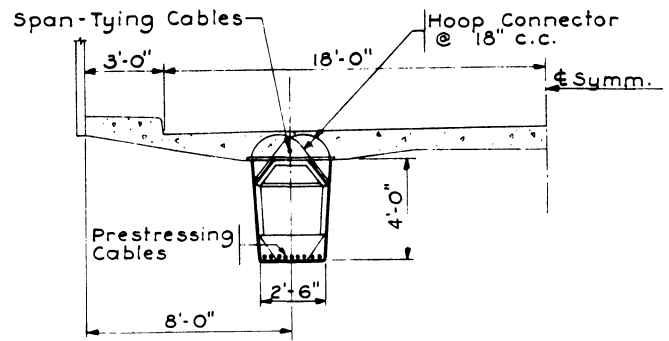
Brits Highway Bridge, Transvaal, South Africa. Spans 83 ft-83 ft-83 ft-83 ft. Two closed steel box girders continuous for four spans. The box girders are strengthened by prestressing cables and composite cast-in-place concrete deck
